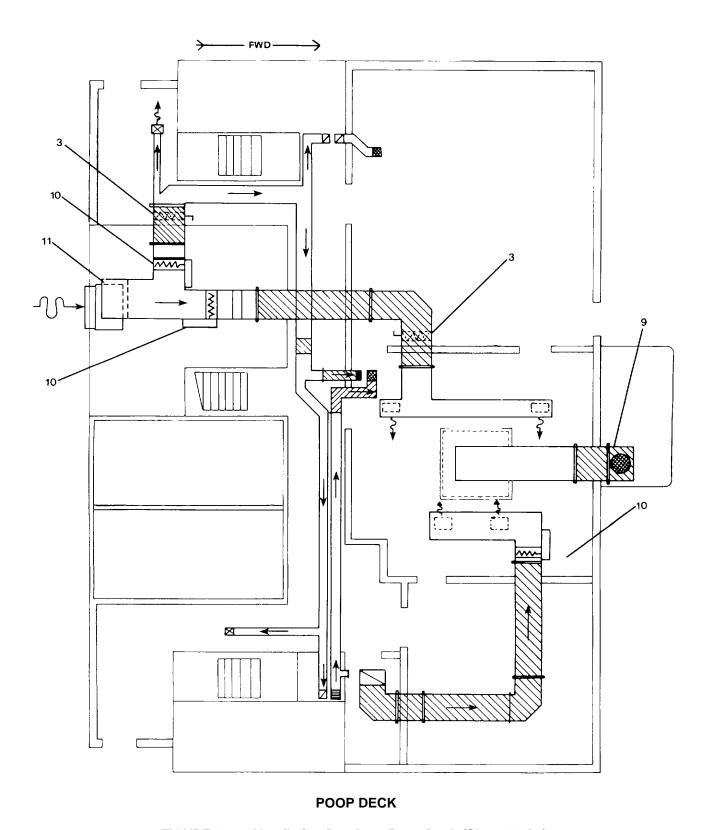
<u>Ventilation Ducting - Poop Deck (Sheet 4 of 6).</u>
